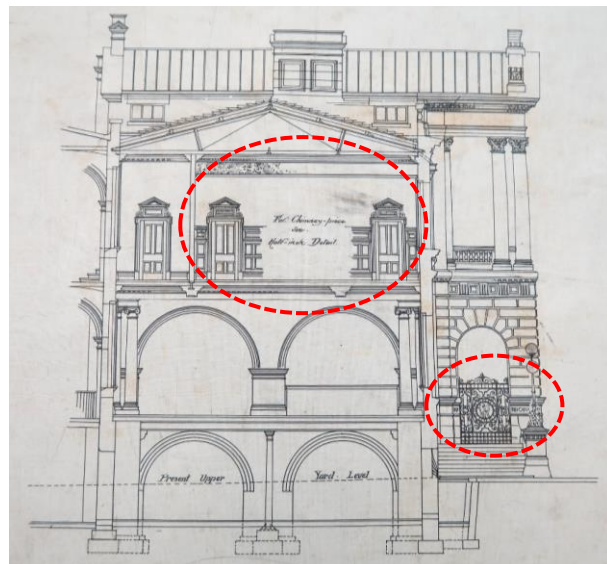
Section E-F (generally as constructed) showing view north, through the centre of the Link Building (features visible include detail of plaster frieze, timber panelling and carved door pediments in the Premier's Room on the first floor, and wrought iron gates to portico – now removed)
